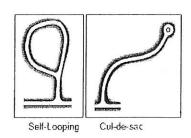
Single Access Streets – Self-Looping Streets and Cul-de-Sacs that have Only One Access Point are "Single Access Streets"
